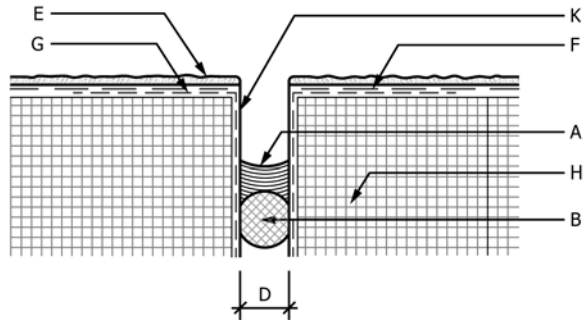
Recessed Sealant Butt Joint Seal (EIFS to EIFS)
